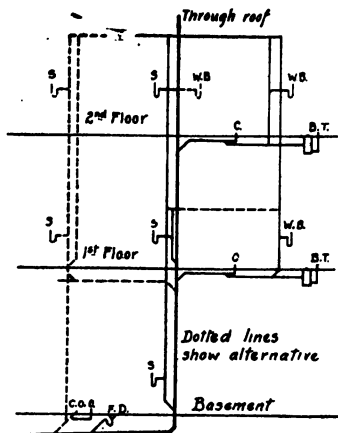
Illustrating minimum requirements for a two-story residence or similar installation.
